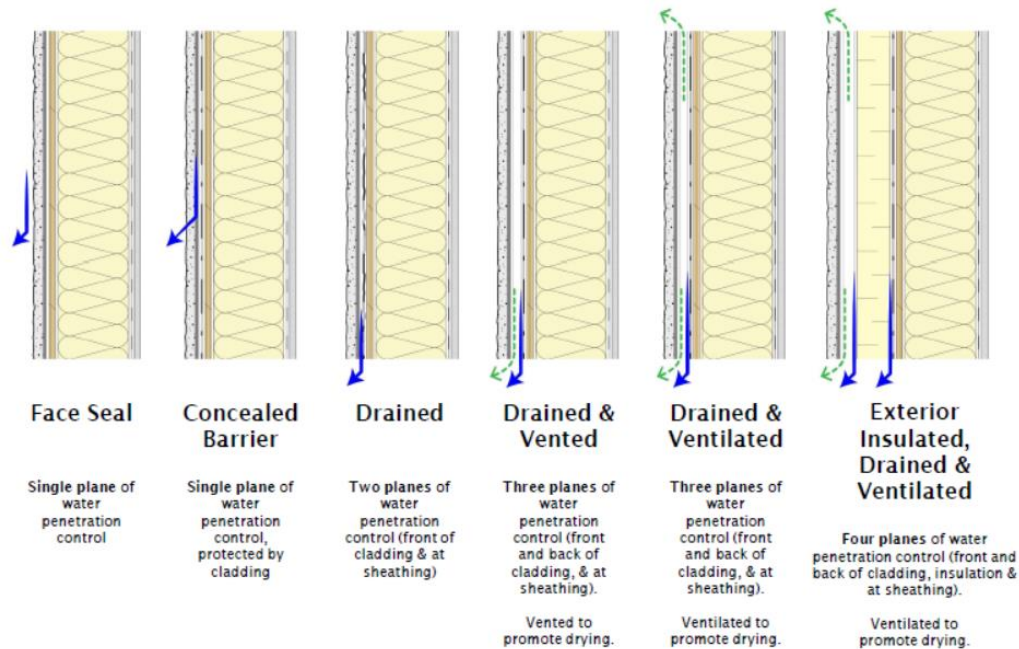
Progression of Wall Water Control and Drying Strategies in Older and Modern Buildings (Passive House Canada, 2021).
